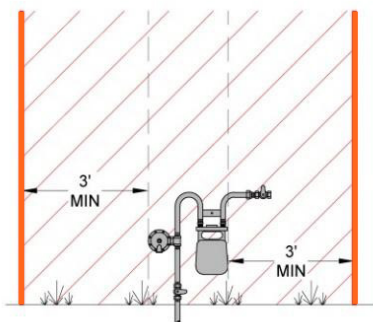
CLEARANCES FROM PAD-MOUNTED AIR CONDITIONERS, HEAT PUMPS, GENERATORS, TRANSFORMERS, INCINERATORS, AND OPEN FLAME DEVICES
